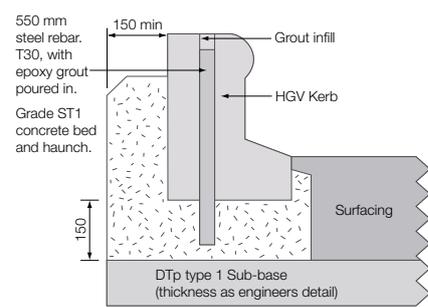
HGV Kerb: HGV with dowel bar detail – typical detail of new installation
